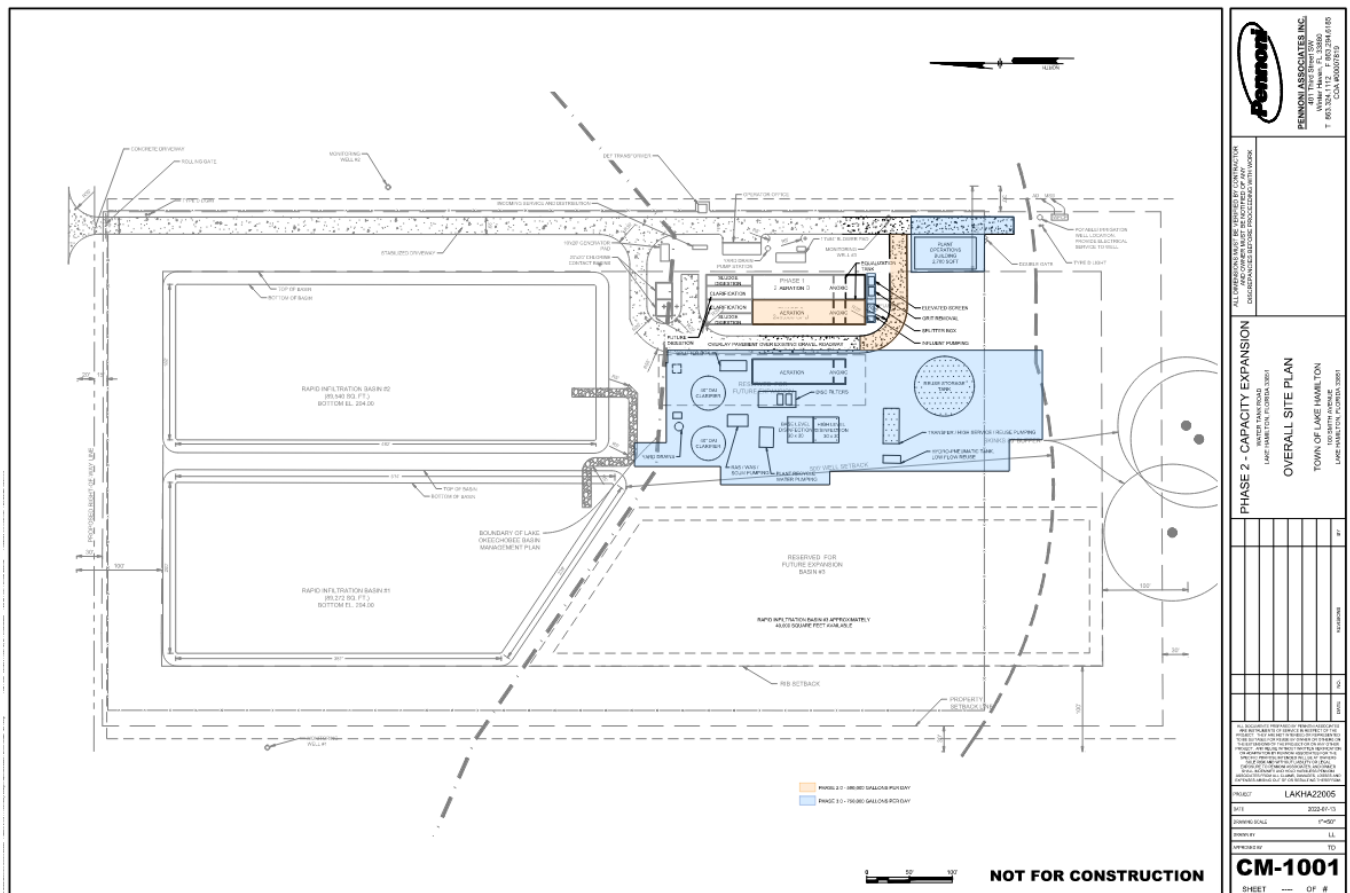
Phase 2 WWTF Site Layout Concept Plan
